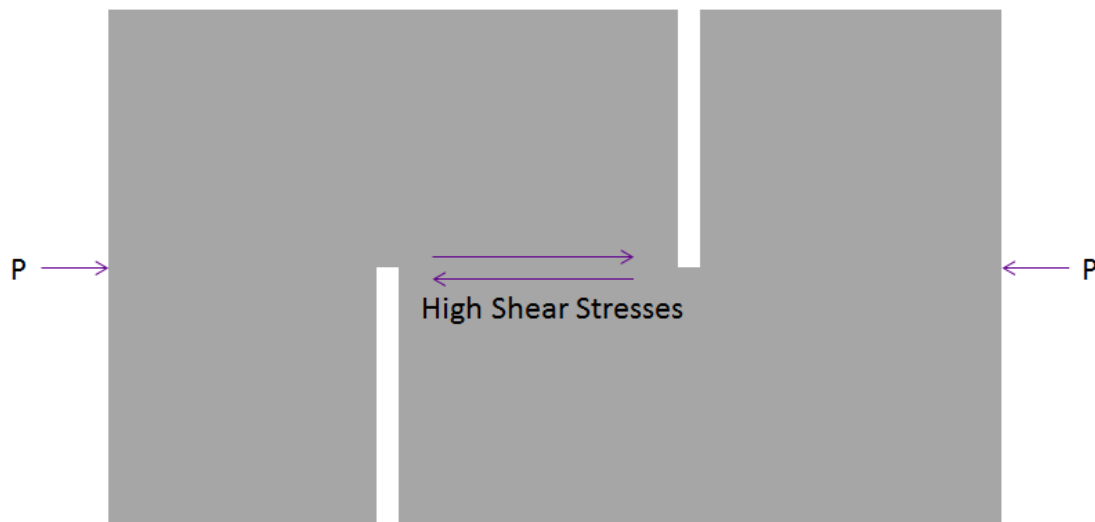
Schematic of Z-shaped concrete shear specimen
